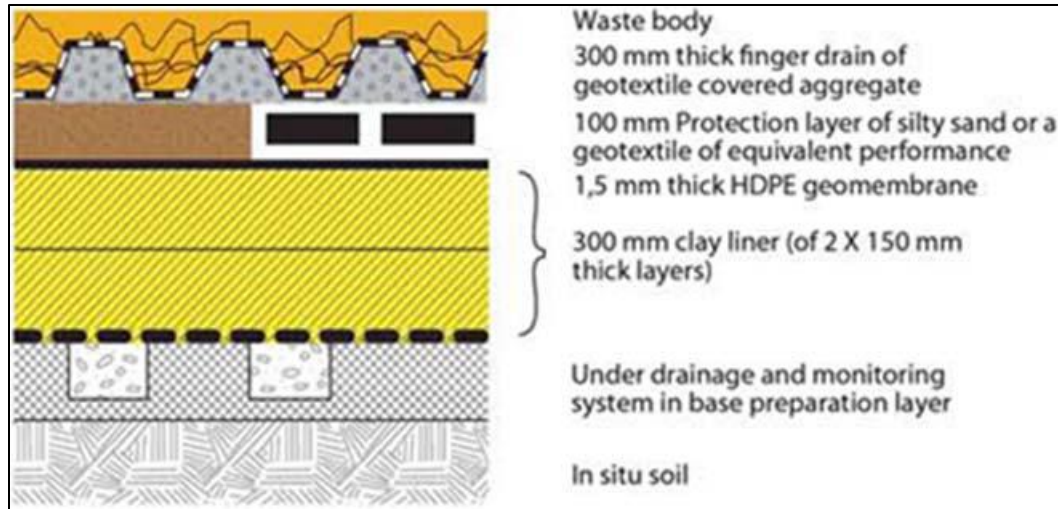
Class C Landfill Barrier System (DEA, 2013b)
